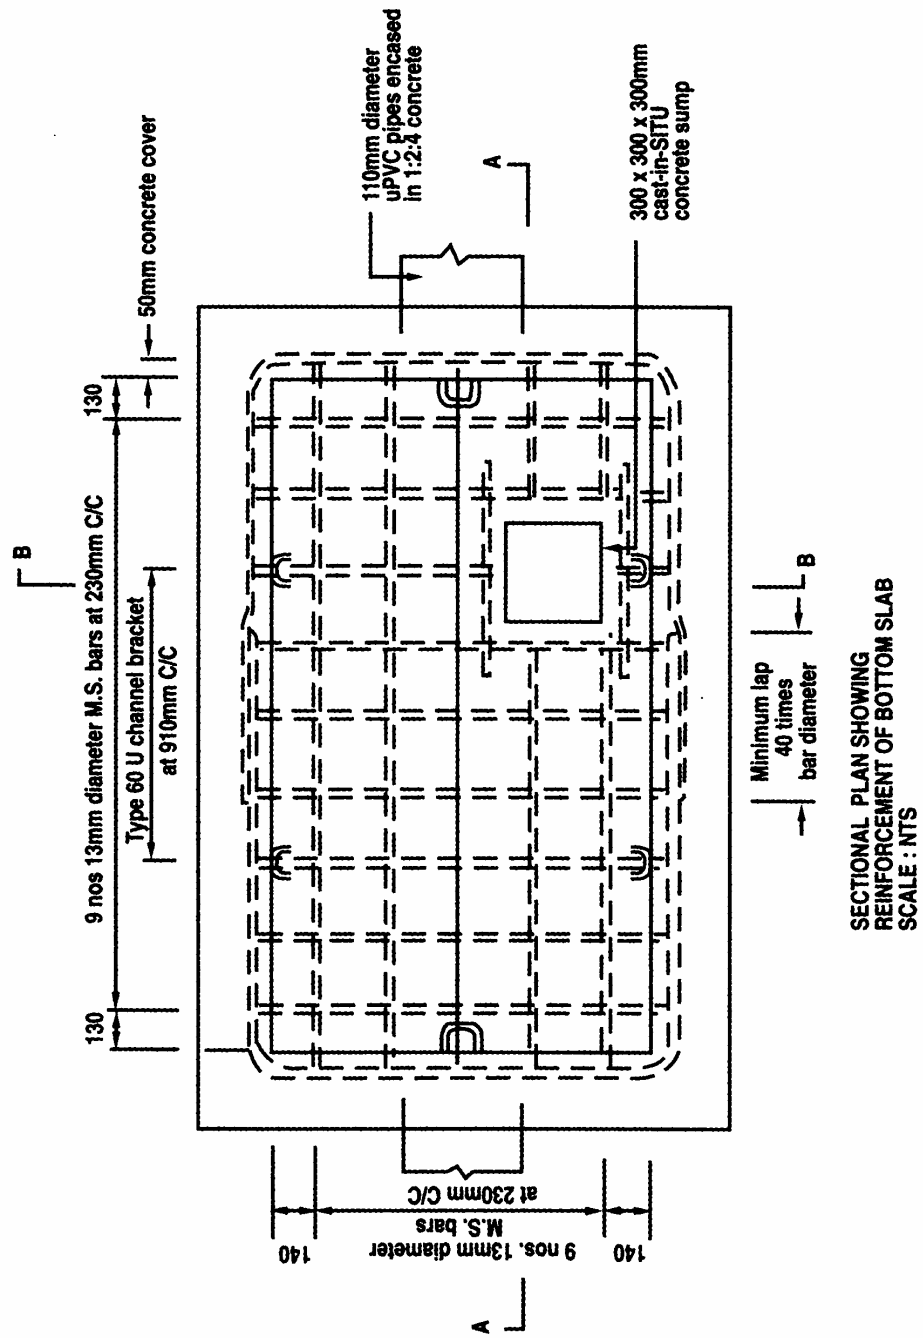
MANHOLE DRAWINGS - TYPE MX3
